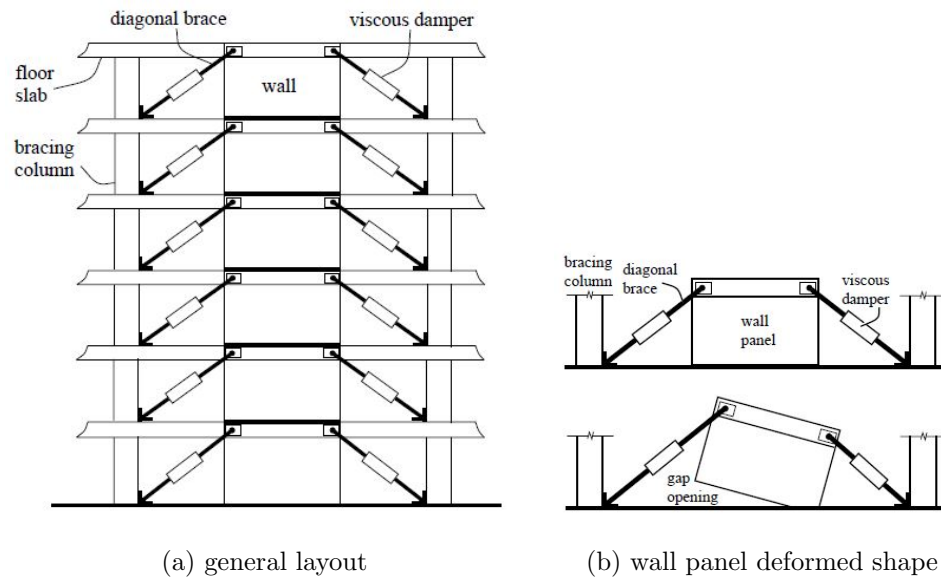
Unbonded post-tensioned precast walls with spread viscous dampers
